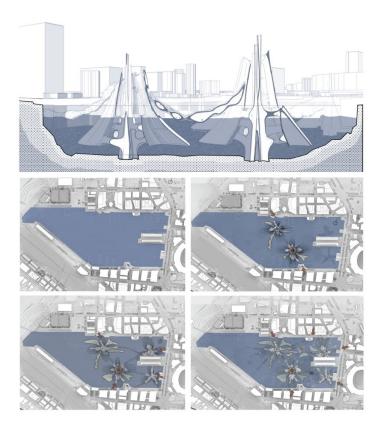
Section through termite-like structure (top) and development of the site plan from 2025 to 2080 (bottom) (Credit: Student team: Michelle Lee, Shilo Burgess and Jiang Zhiyuan – Instructor: Justyna Karakiewicz)
